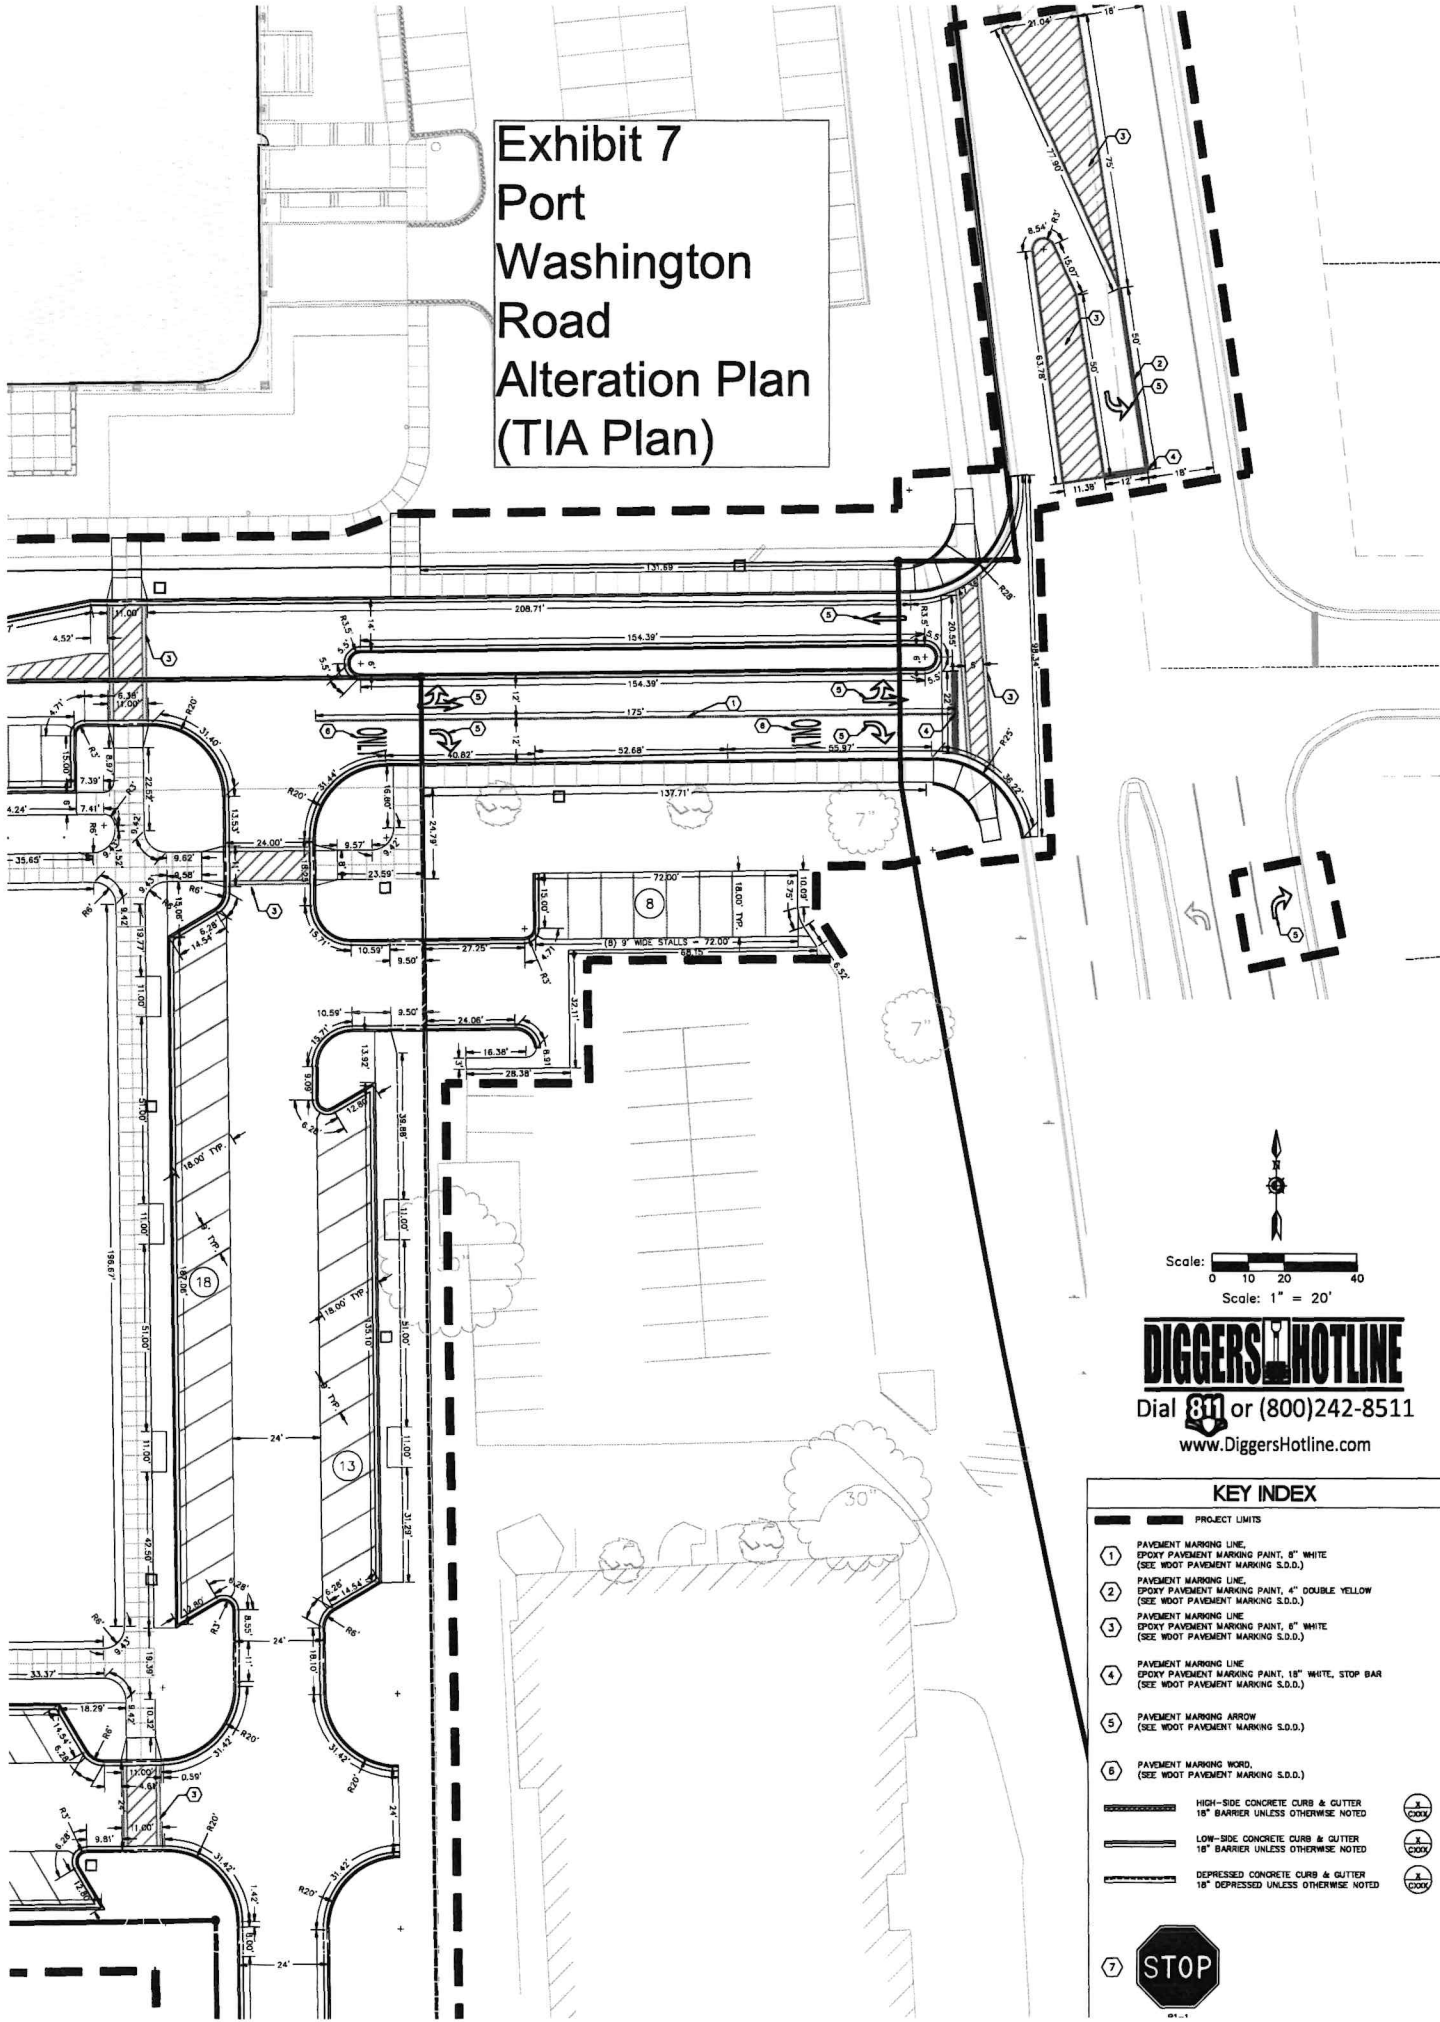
Port Washington Road Alteration Plan (TIA Plan)
